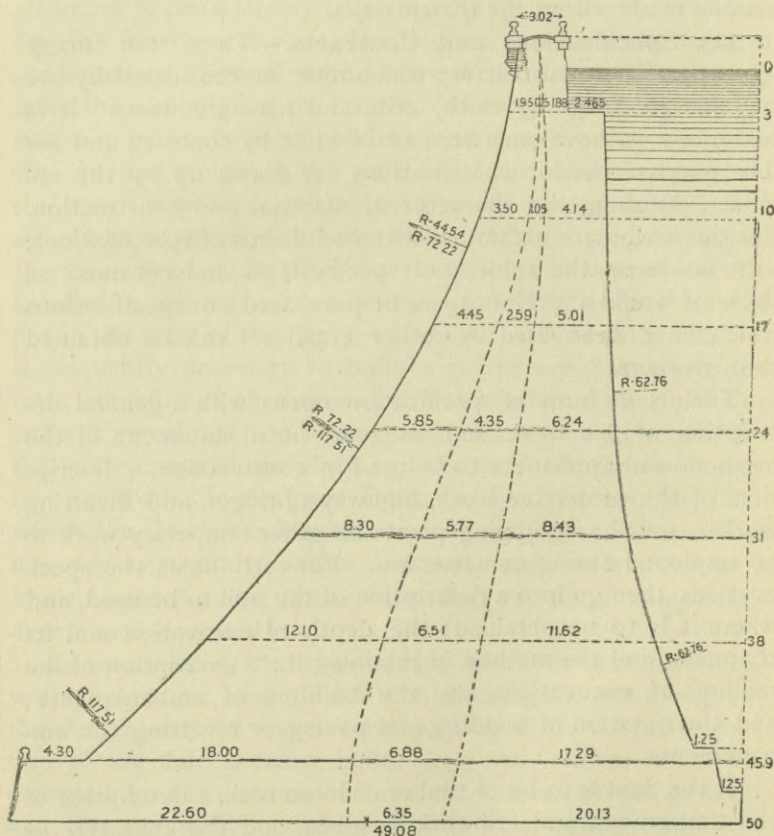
CROSS-SECTION OF FURENS DAM, FRANCE.
